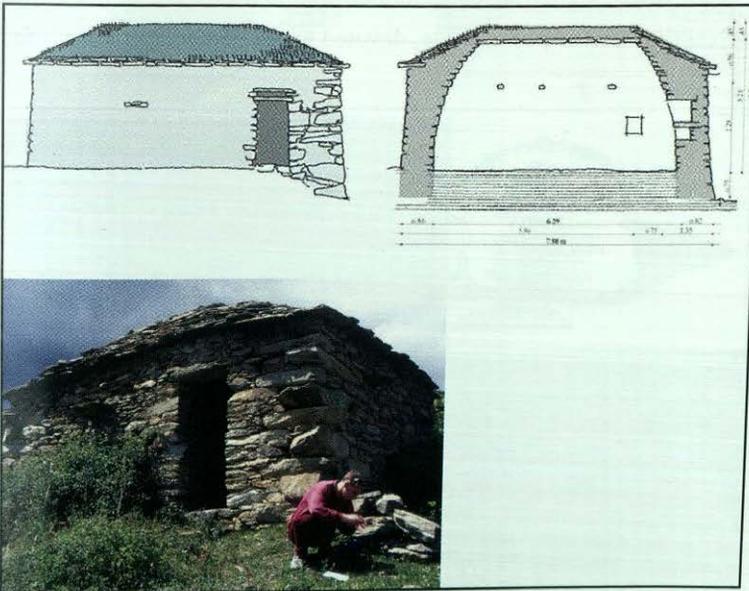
Corsica, paghliaddiu at Santu Pietru in the north of the island. Inside the object can be found a lot of in-built fittings. a/ technical drawings, b/ photo 1998.
